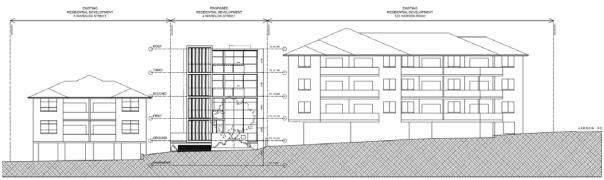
Extract of submitted amended Streetscape plan (source: Streetscape plan prepared by CMT architects, dated 13 November 2015)
